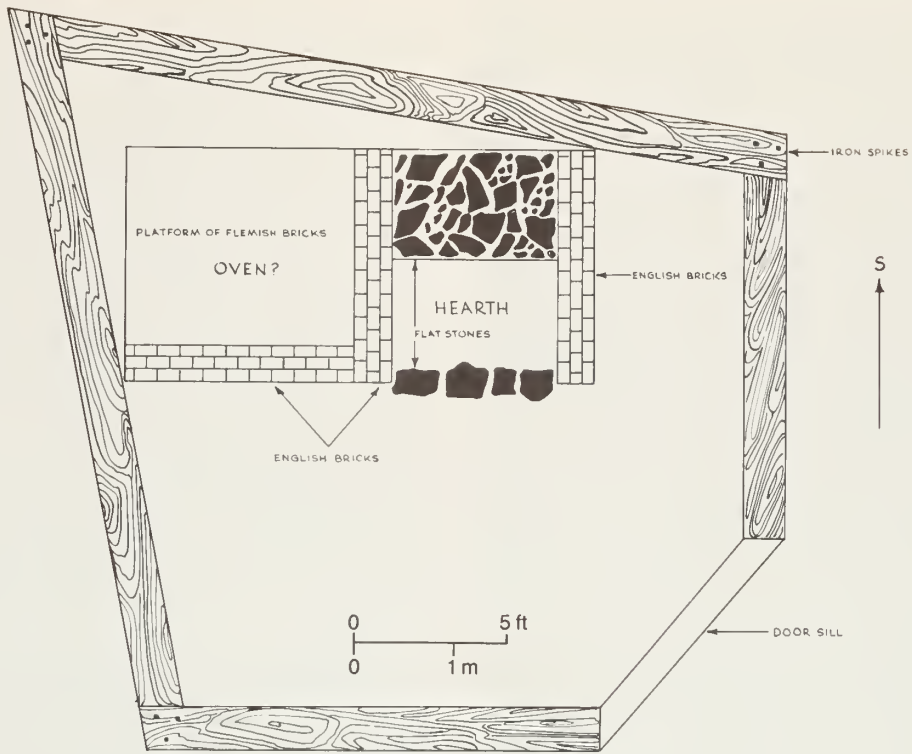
Ground plan, southeast flanker, Fort Albany.
